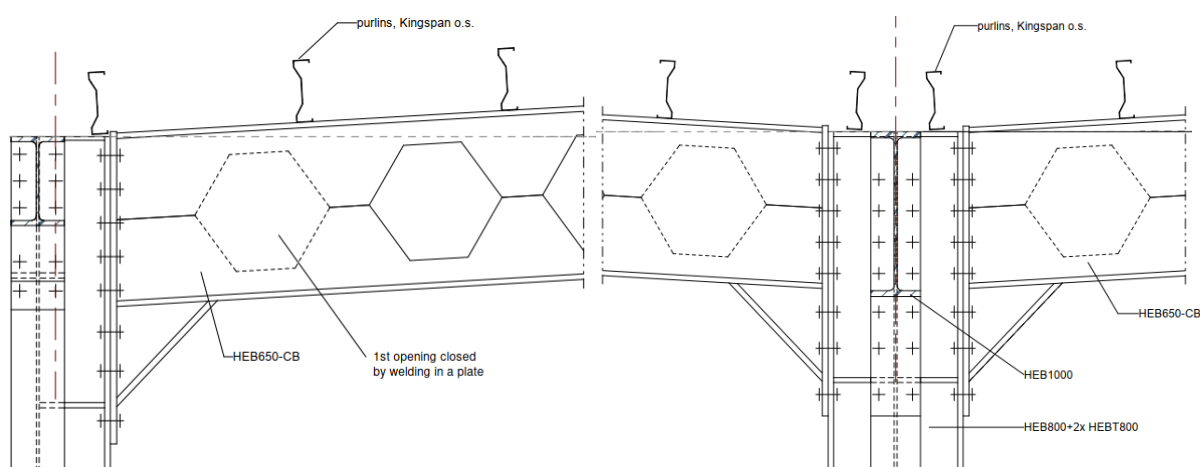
Details of connections between column and roof beams for another building of the same client. These drawings are made for another building, but they do provide insight in what the design could look like with haunches included. Left: Drawing of the roof beam and the façade column; Right: Drawing of the internal connection between roof beams and column. In this design, the roof beam is not continuous. (Royal HaskoningDHV Internal Document, 2020b)
